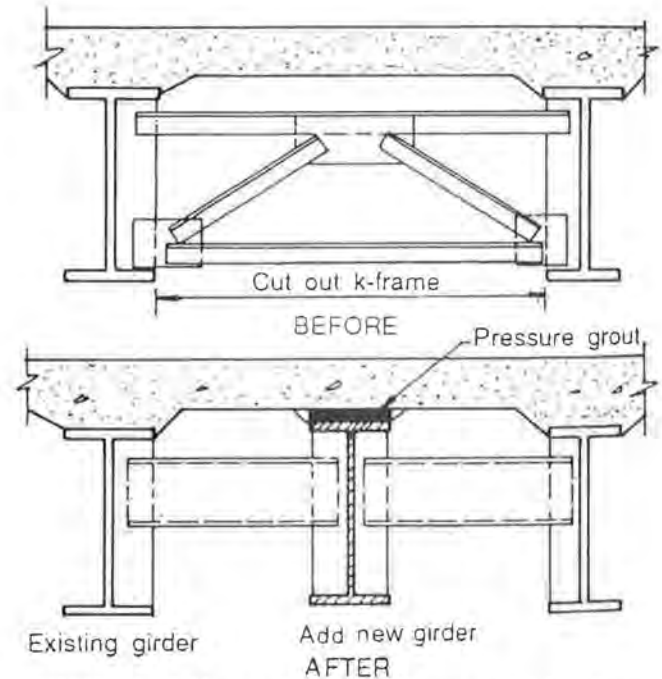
Adding girders. (From *Concrete Bridges*, by V.K. Raina.)
